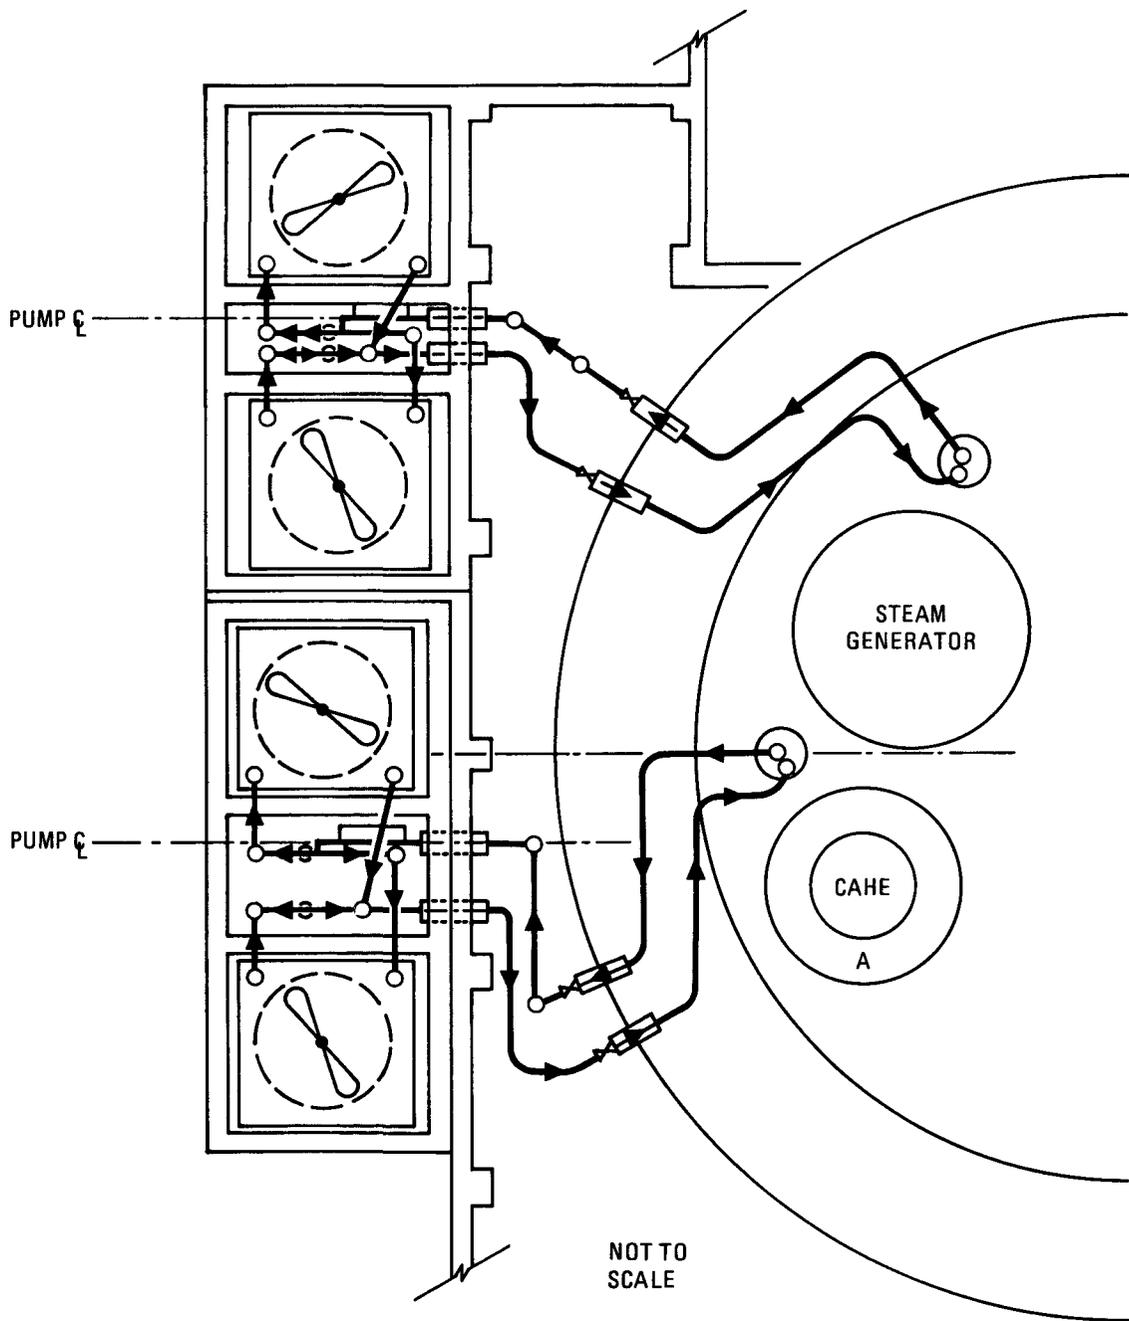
CACWS piping: (b) plan view (sheet 2 of 2)
